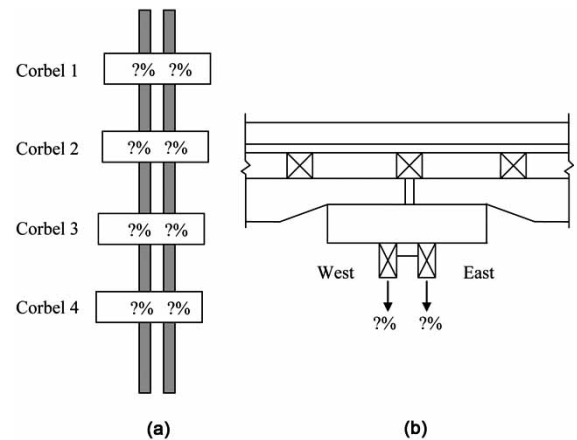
Load sharing between the eastern and western half-caps at the corbels (plan view - pier north loading) (a) plan view, and (b) elevation view.
